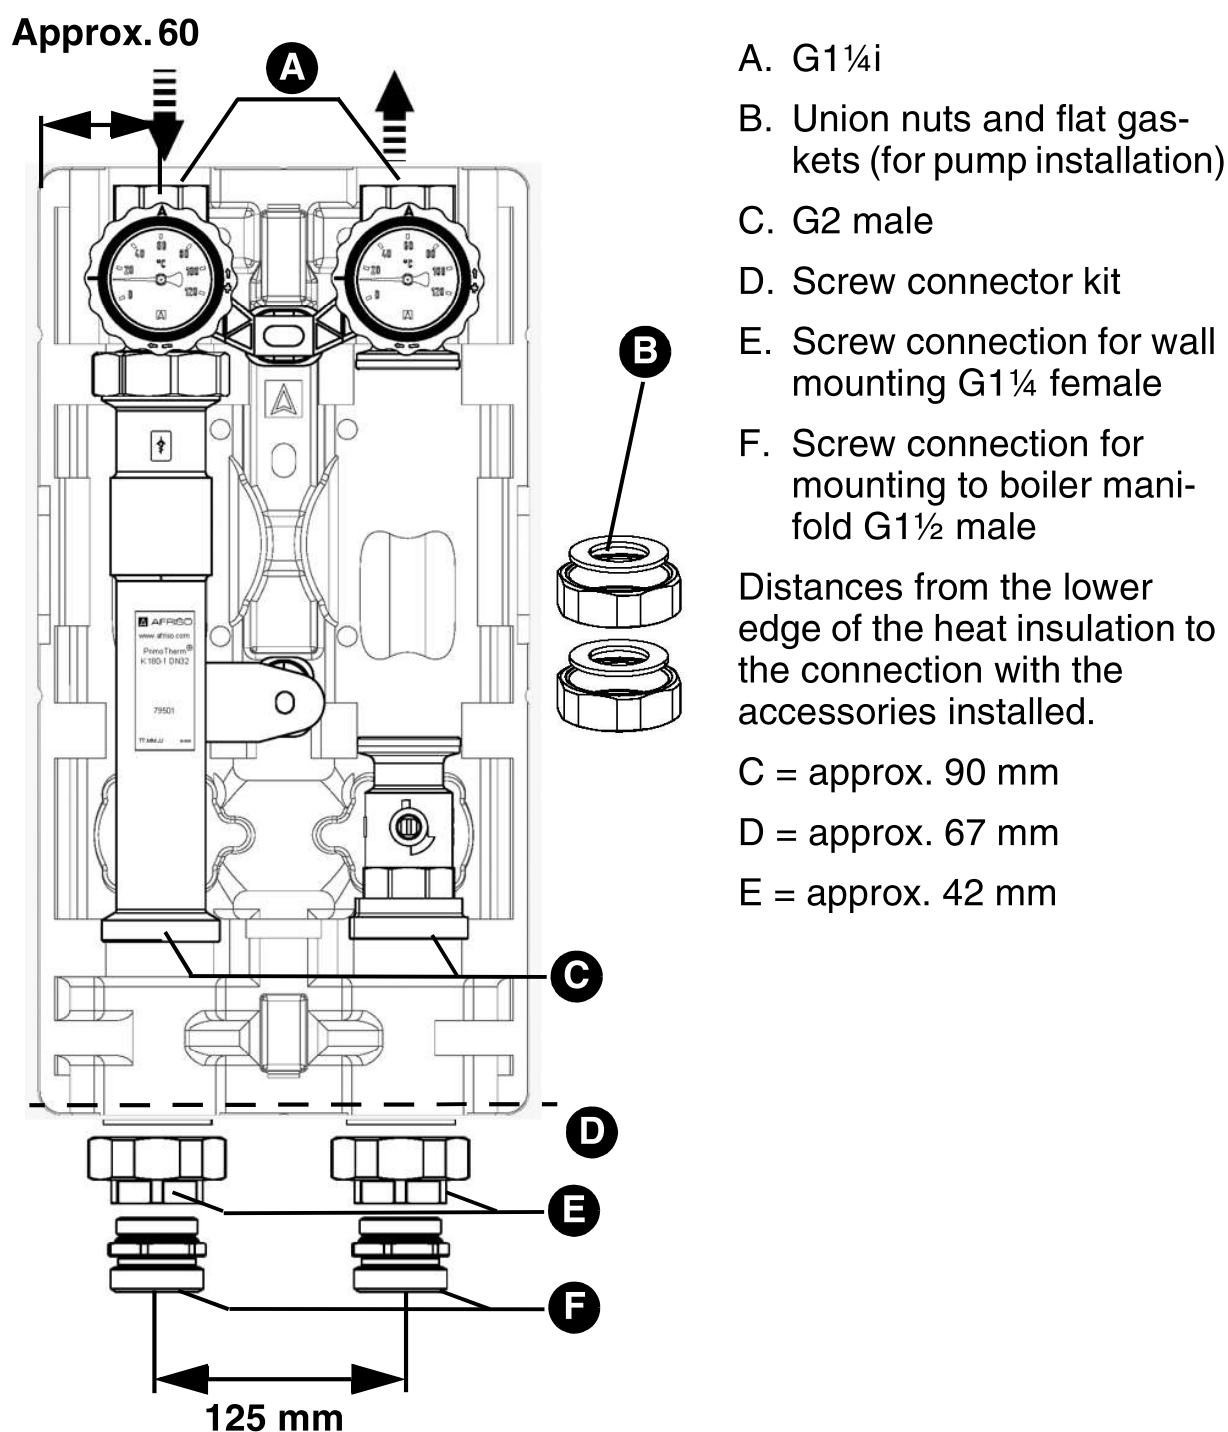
PrimoTherm® K 180-1 with screw connector kit
